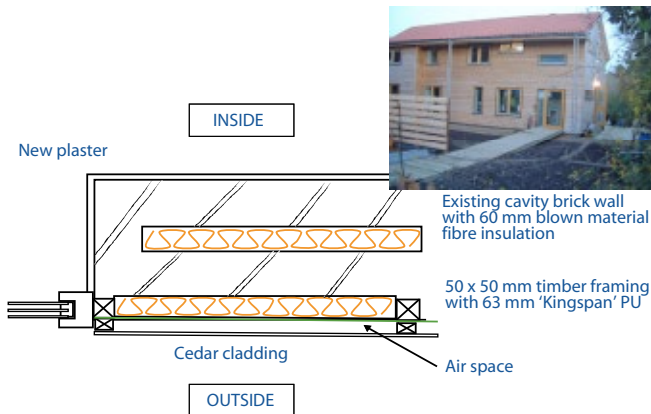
Insulated timber cladding to a cavity wall house. Picture: Tony Cleford
